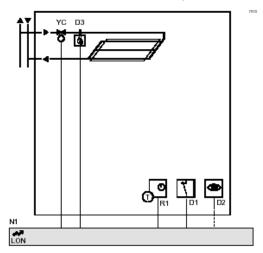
Chilled ceiling with dew point monitoring (example: Siemens DESIGO RX)
